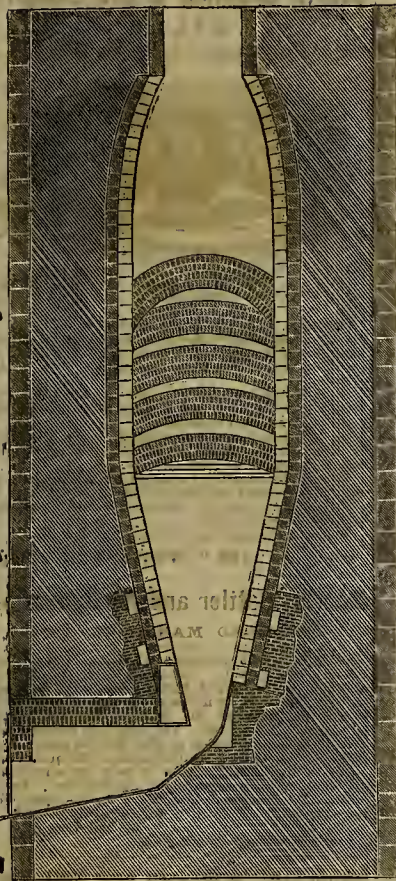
Cross Section of Furnace, Walls and Vapor-Way Arches.
